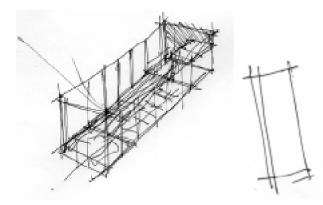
Noi's drawing of an isometric perspective that was derived from extruding floor plan. (a) the perspective view showing light ray coming in from the window. (b) a floor plan drawn to explain windows on the left side.
